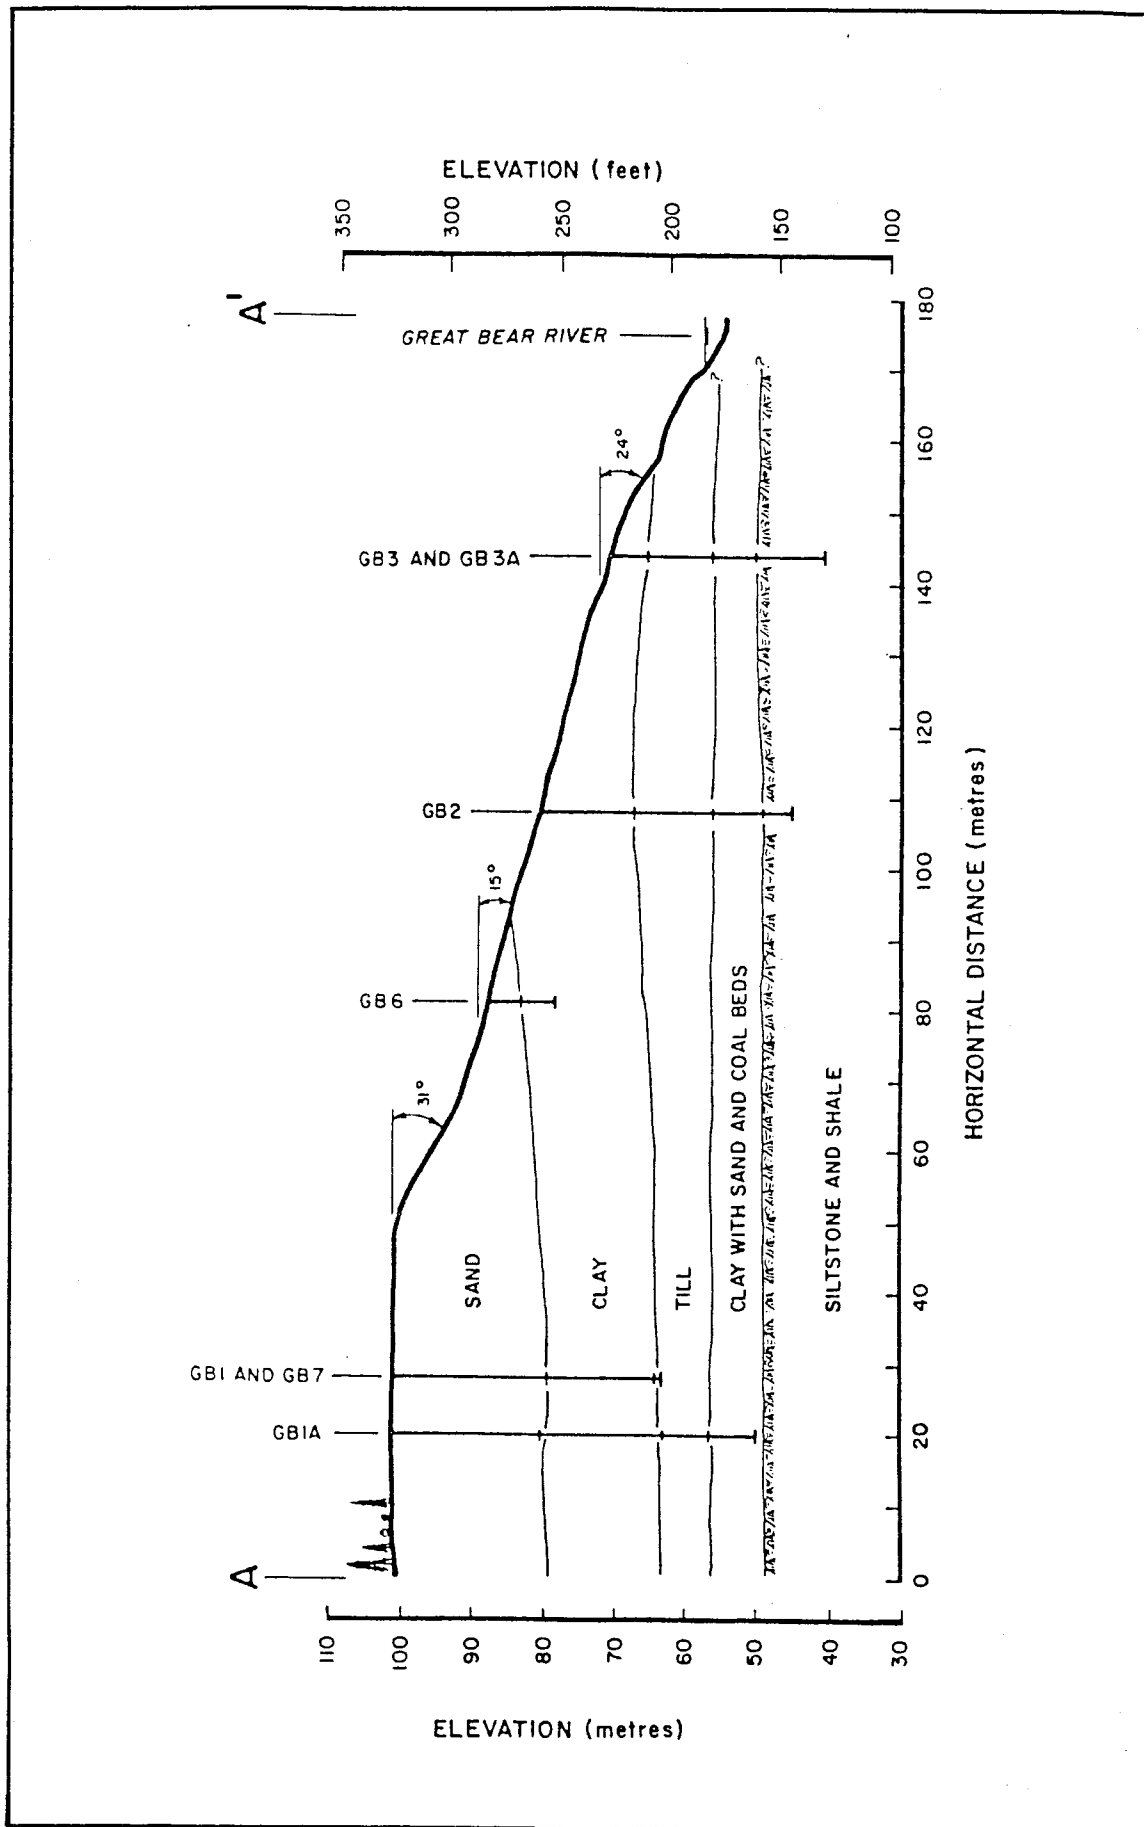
STRATIGRAPHIC CROSS SECTION; LEFT BANK OF GREAT BEAR RIVER AT PROPOSED ARCTIC GAS CROSSING (Savigny, 1980)
